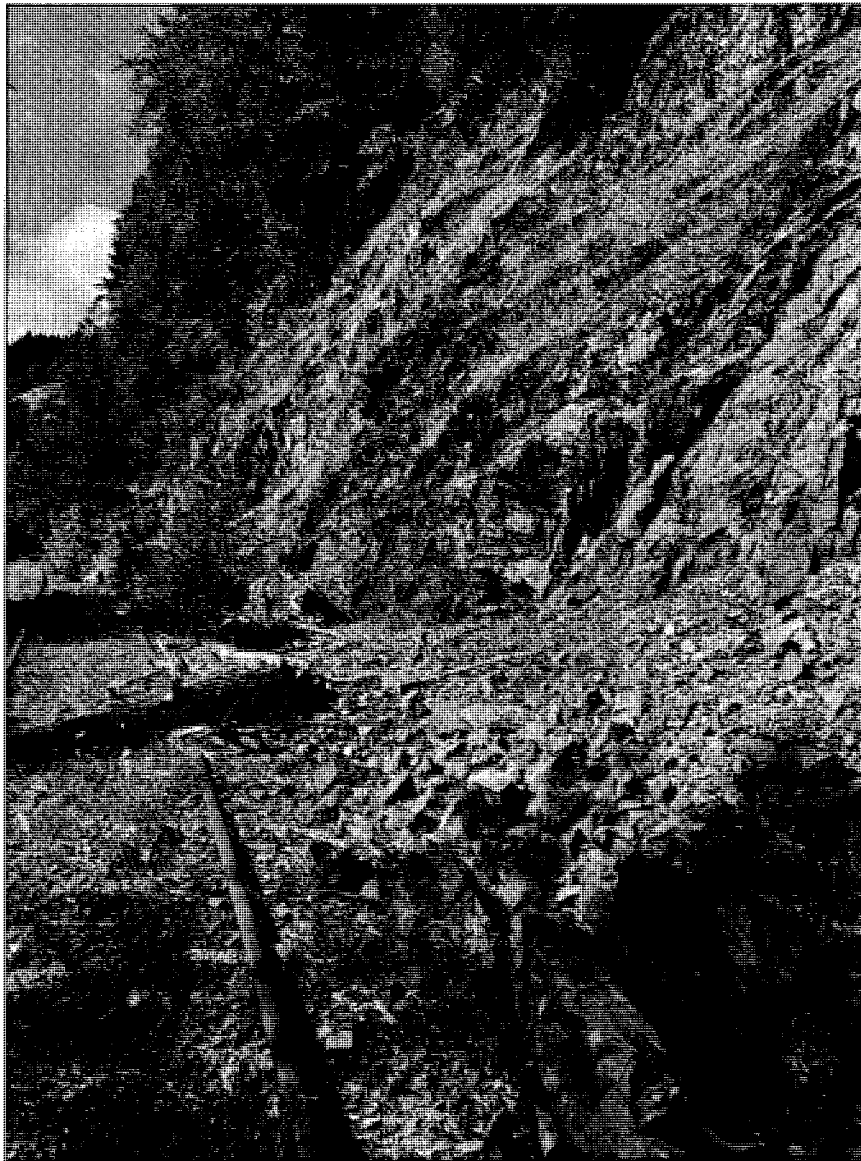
Photo 65 – Fragments of highly fractured siltstone and mudstone raveling from rock slope at approx. MP 147.3
